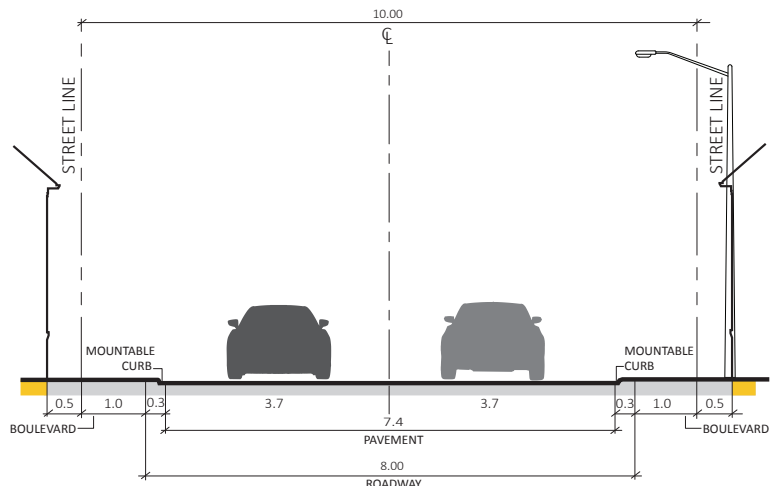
Laneway (10m R.O.W.) Cross-Section
